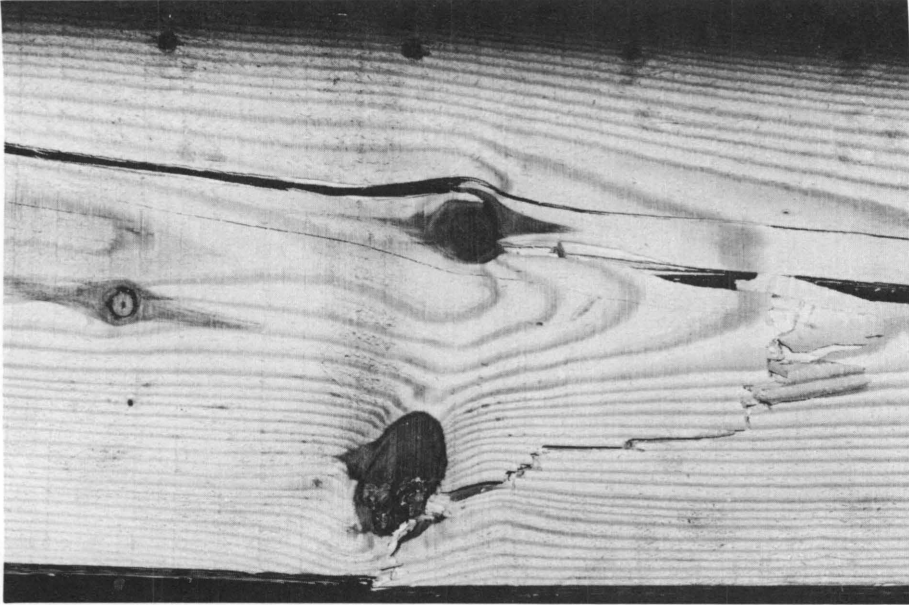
JOIST 3 OF SPAN 3, EAST SIDE
